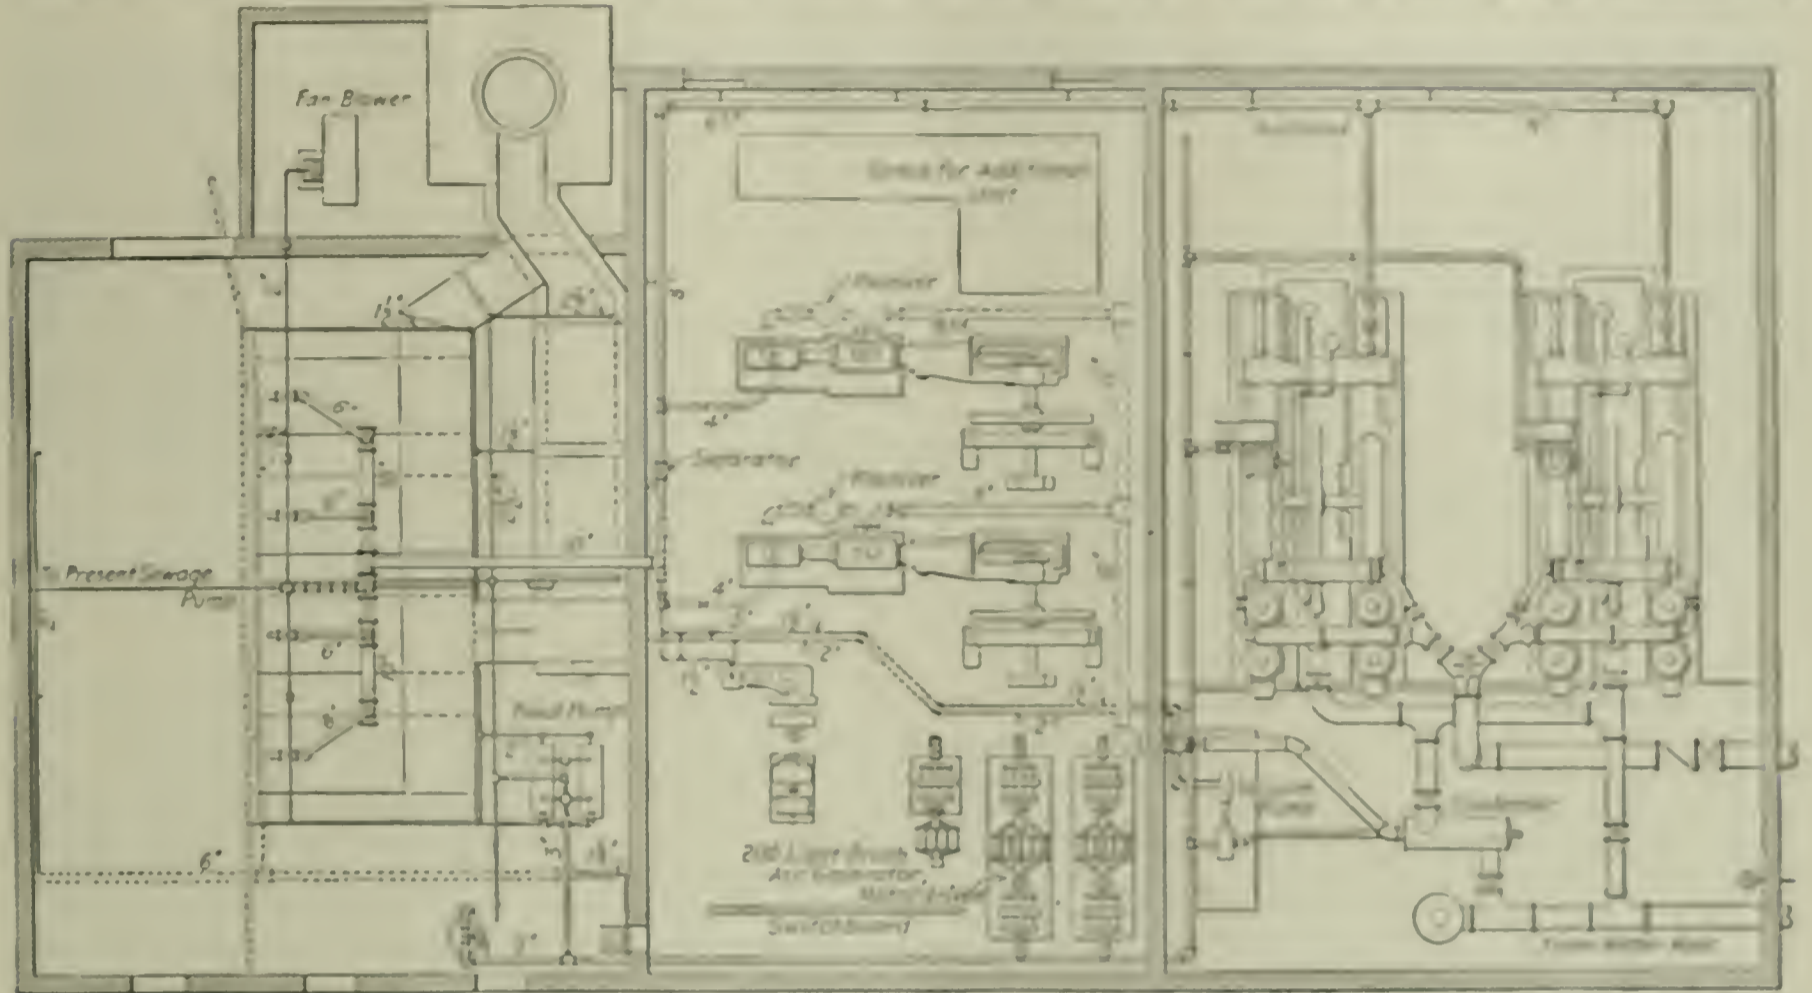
PLAN VIEW OF BOILER, ENGINE AND PUMP ROOMS
